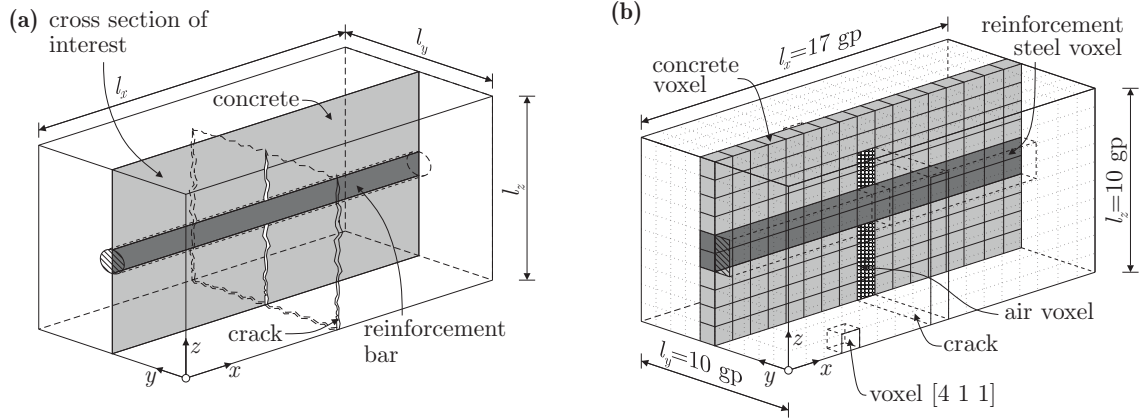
(a) Representation of a cracked concrete cuboid with one reinforcing bar (one cross-section is highlighted) and (b) the discretization scheme of the cracked concrete cuboid (Figure taken from [16])
